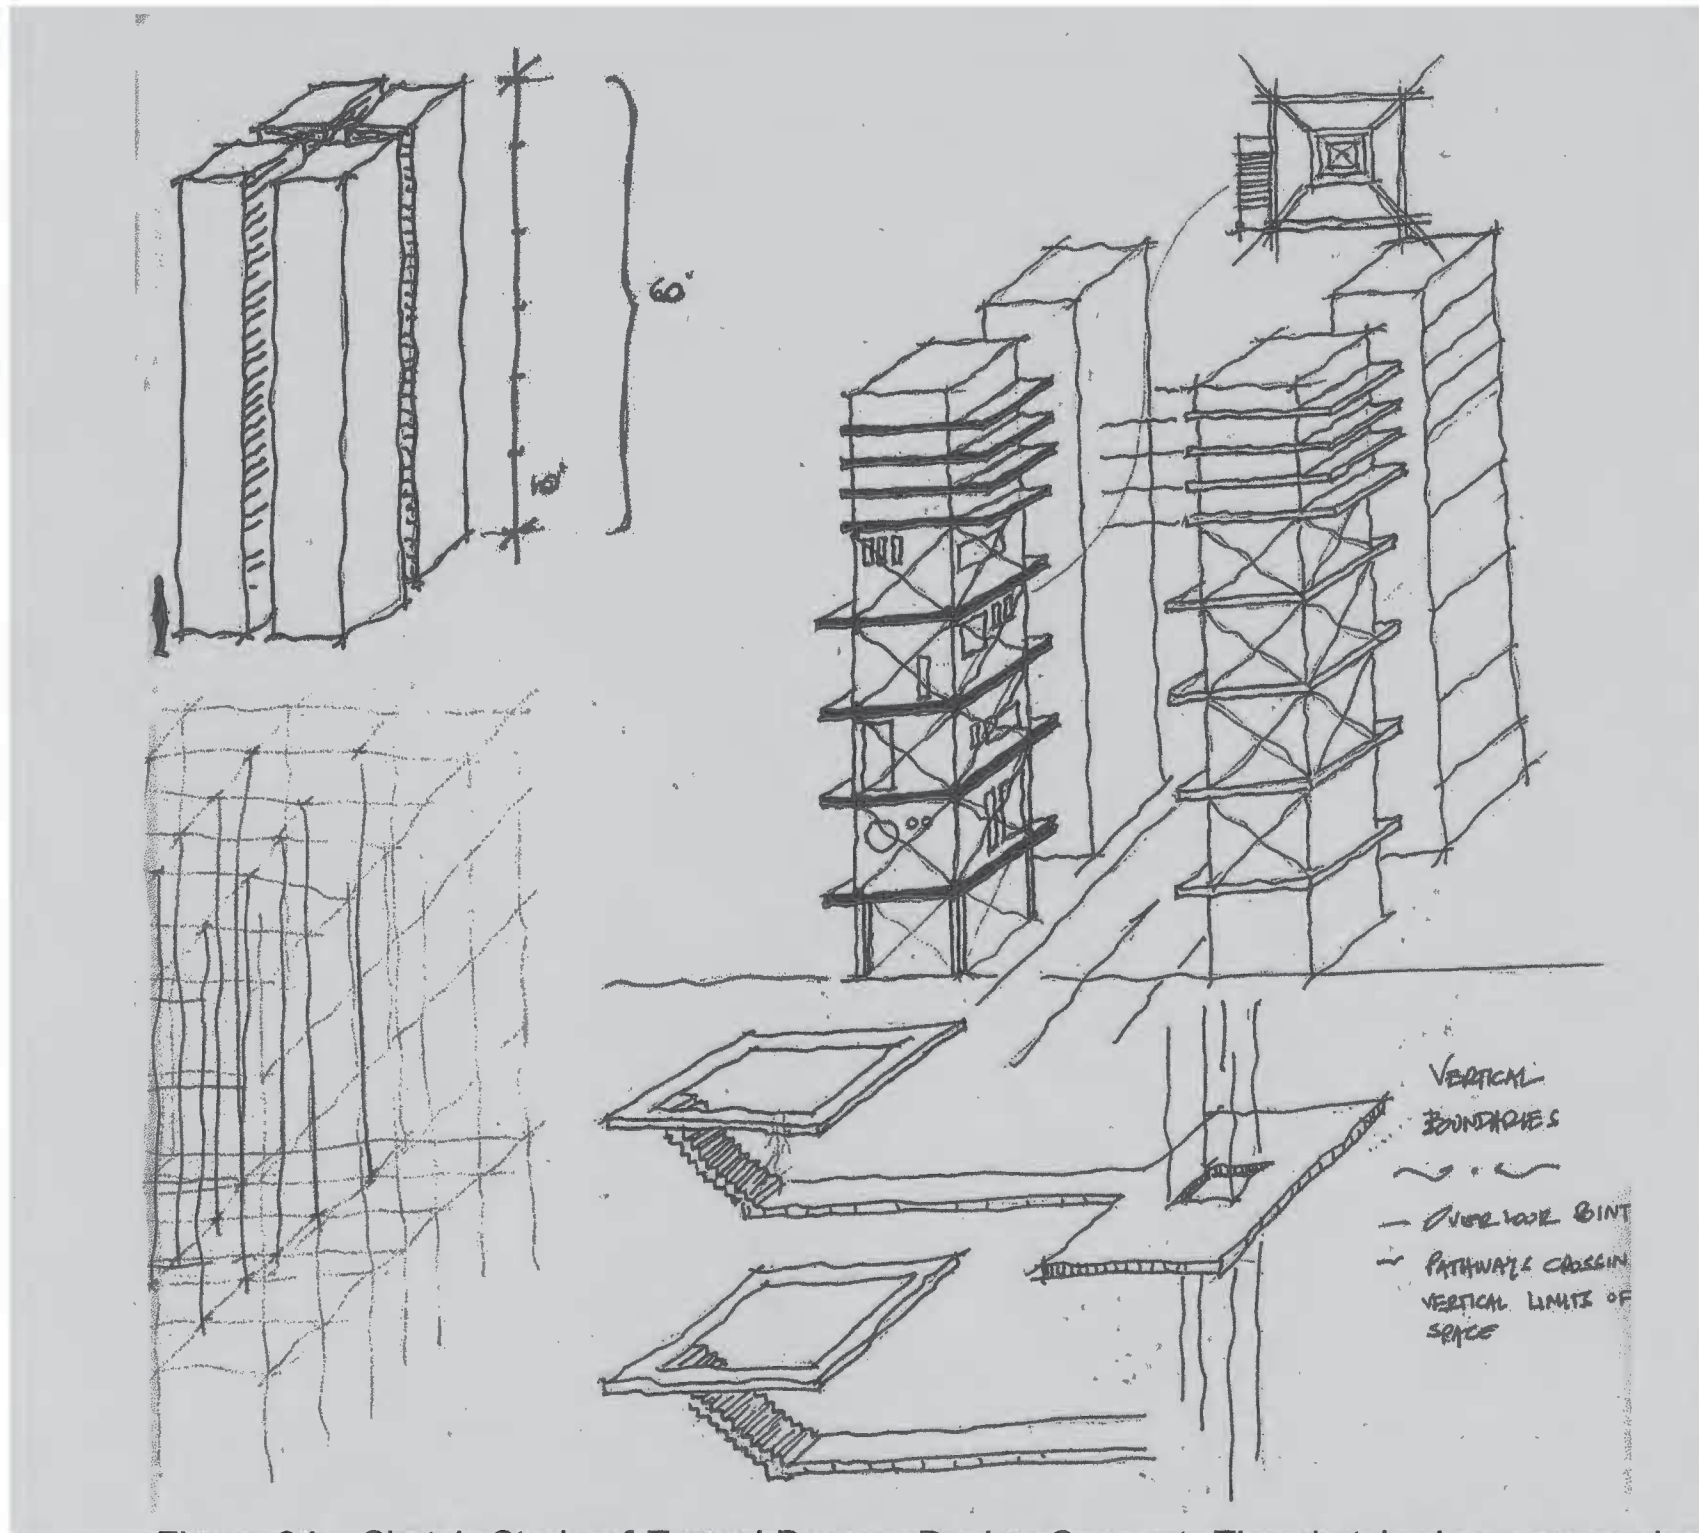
Sketch Study of Tower/ Beacon Design Concept. The sketch shows an exploration of tower structures as beacons within the neighborhood surrounding Lincoln Road. The towers can be used as illuminated beacons during the night that draw people to the area and display pieces of art through their large glass panels.
